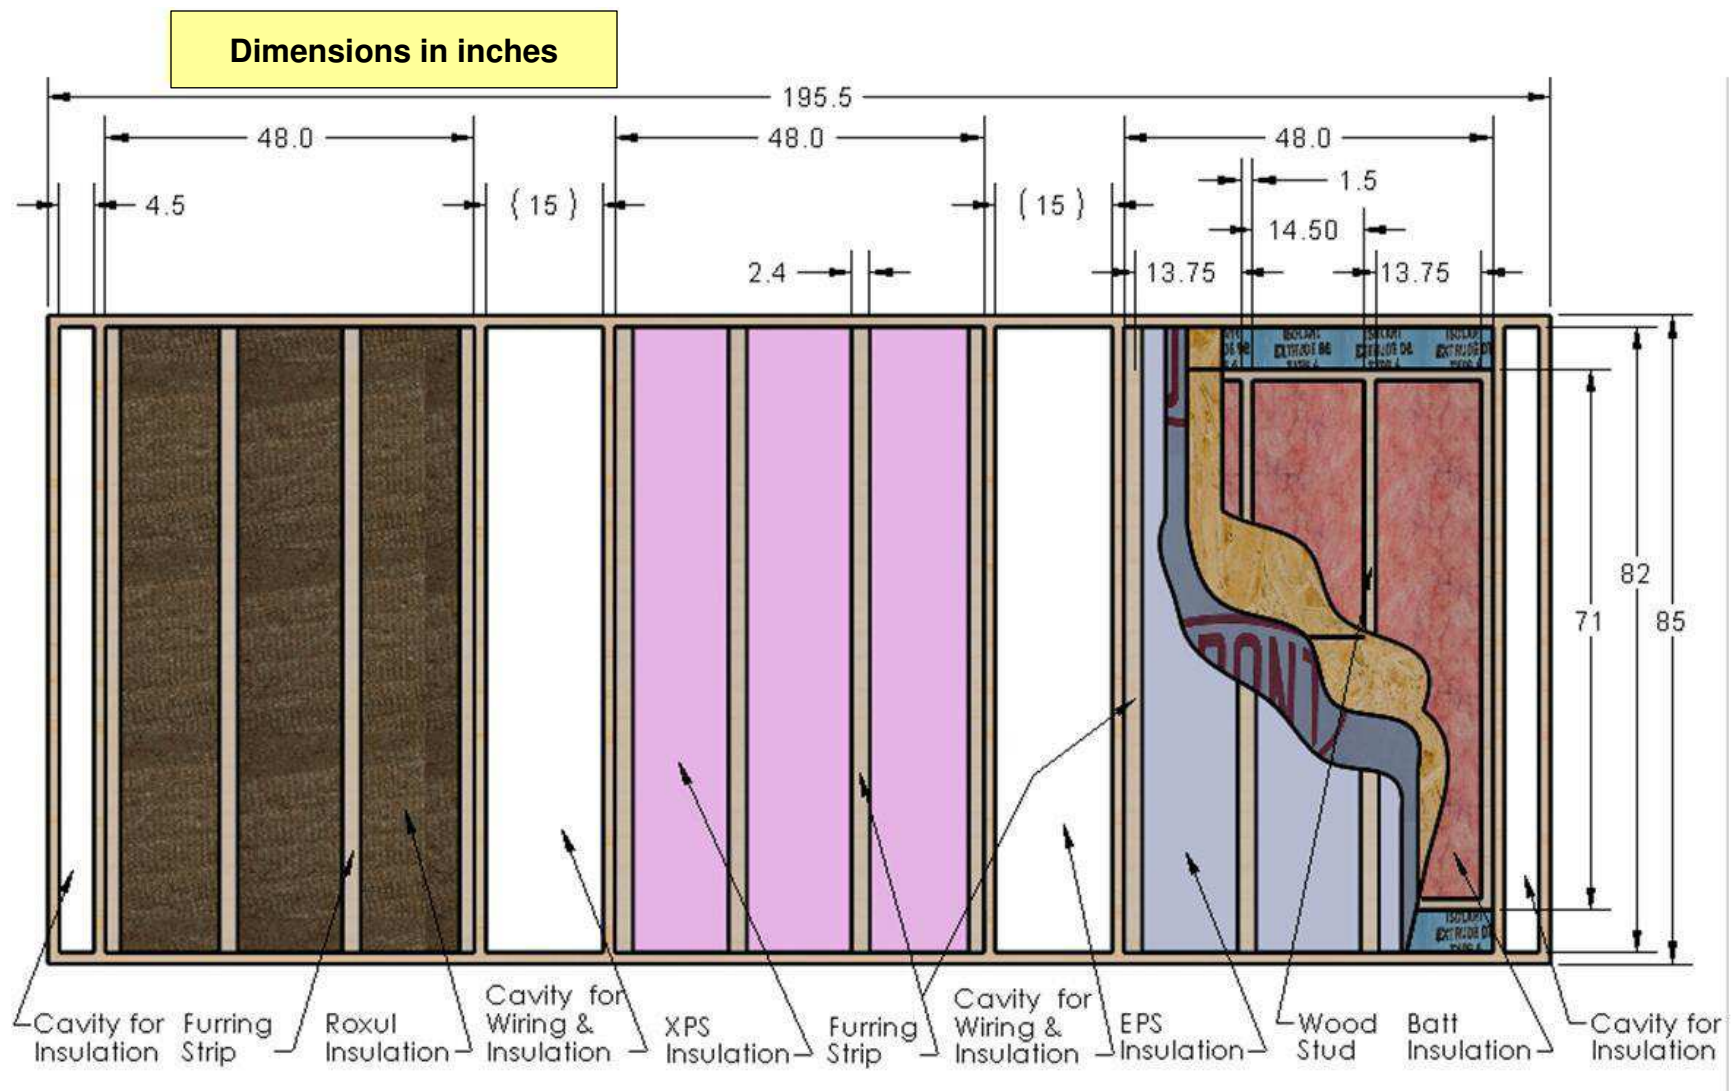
Schematic of three residential 38 mm x 140 mm (2 x 6 in.) wood-frame wall test specimens installed side-by-side in the FEWF
